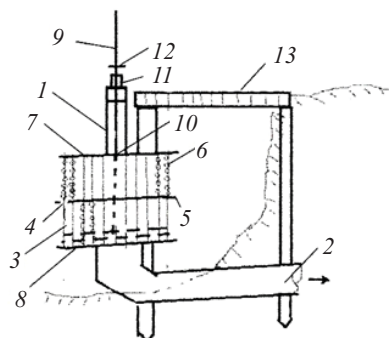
Water intake head [15]: 1 — frame with lifting mechanism; 2 — water intake pipe; 3 — grid; 4 — holes; 5 — ring; 6 — balls; 7 — top cover; 8 — headliner plate; 9 — rod with screw thread; 10 — fastening unit; 11 — nut; 12 — rotation wheel; 13 — shore bridge
